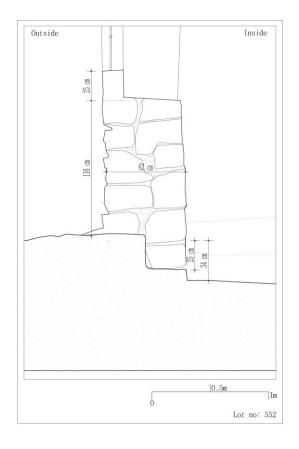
36 Double sided walls constructed with rough cut stones-ground floor wall
